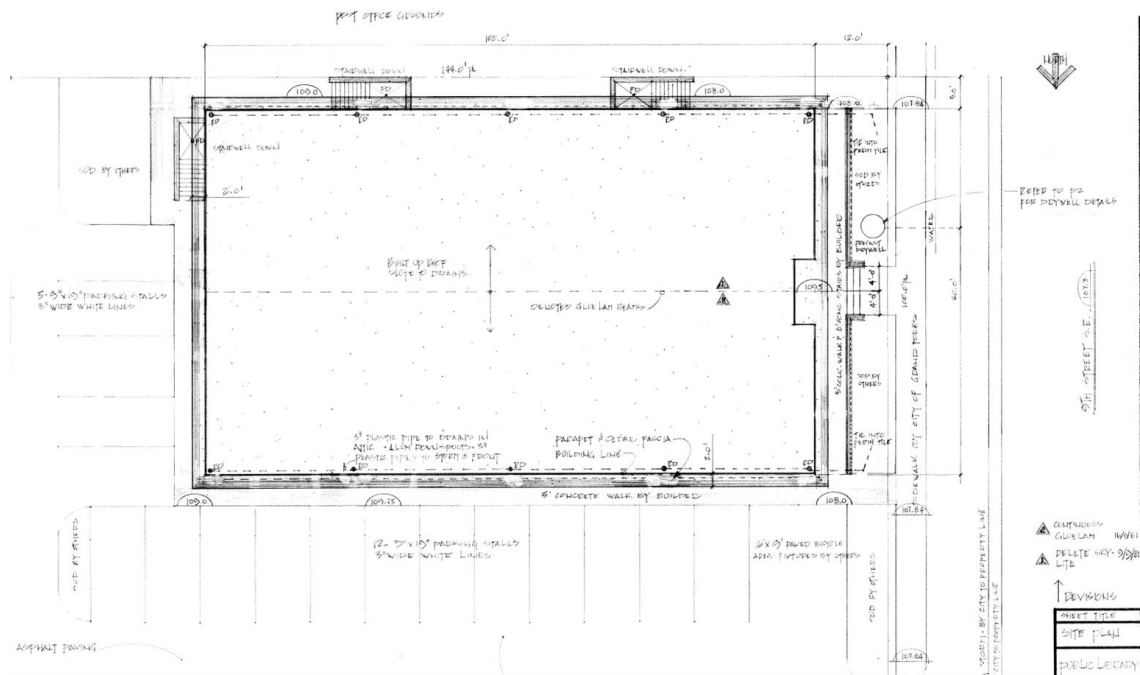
Original site plan dated 1981 (note: 5th Street is marked as 9th Street)
